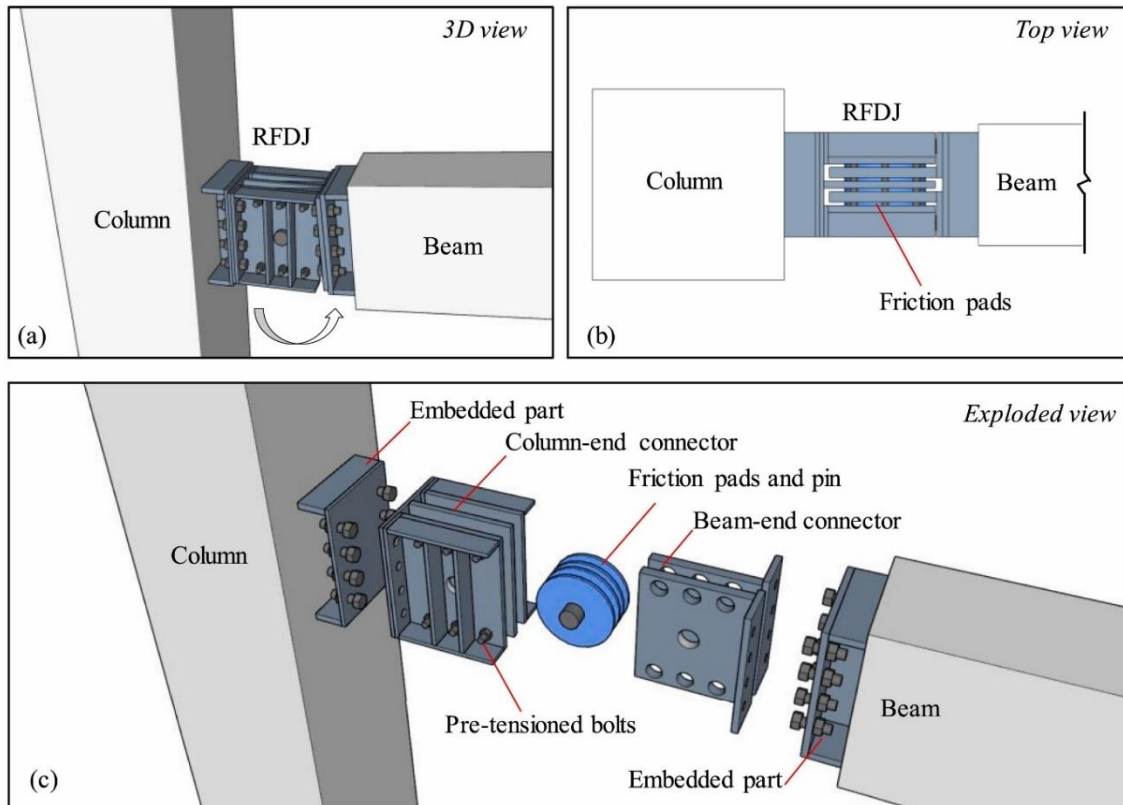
Prefabricated steel joint (PSJ) configurations of prefabricated beam-to-column steel joint. [122].
